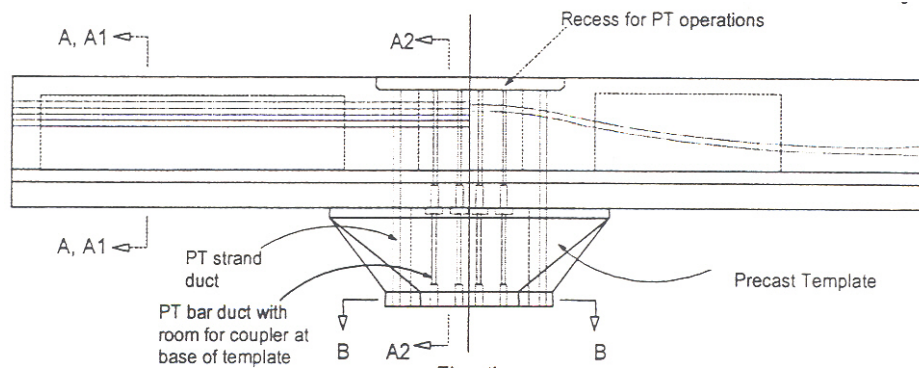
Typical segmental column connection surface (Billington et al. 1999)
